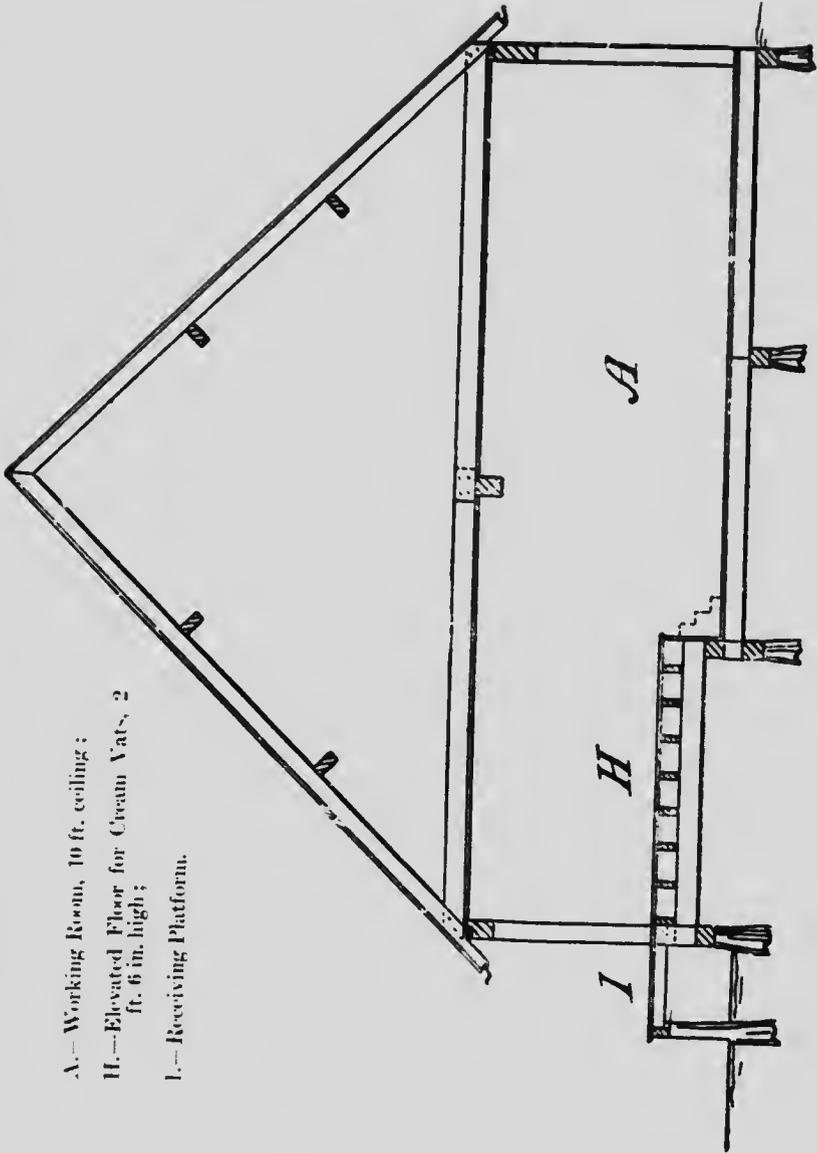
Fig. VII shows the plan for a Creamery under the cream-gathering plan of 700 to 1,000 cow capacity.
